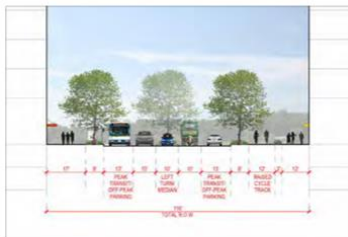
Cross section showing improvements to Eisenhower Avenue - "A" street
